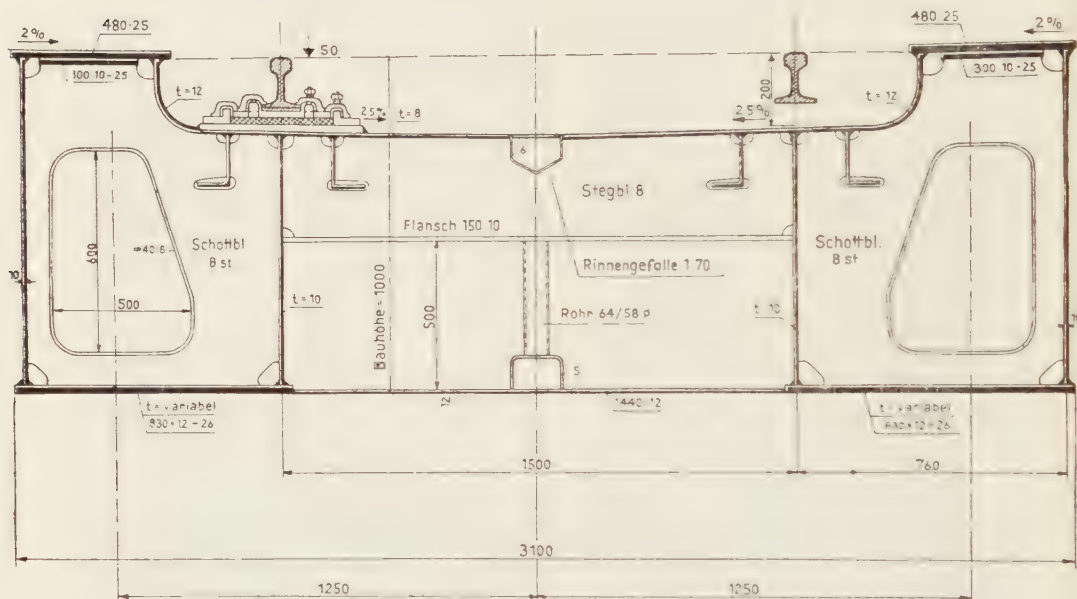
Transversal section of metal caisson bridges for the bridge over the Mörfeld to Frankfort (Main) road.
